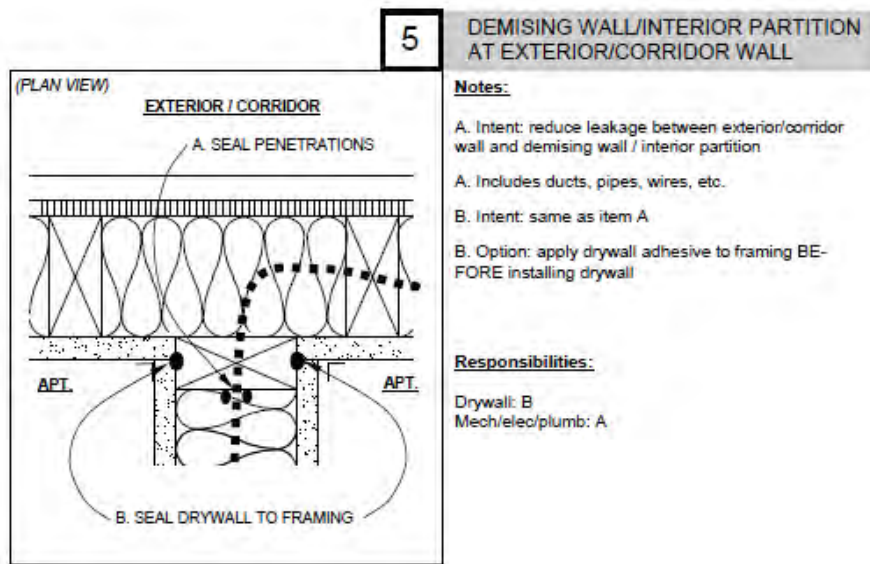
Air sealing detail—seal drywall to framing at wall intersections
